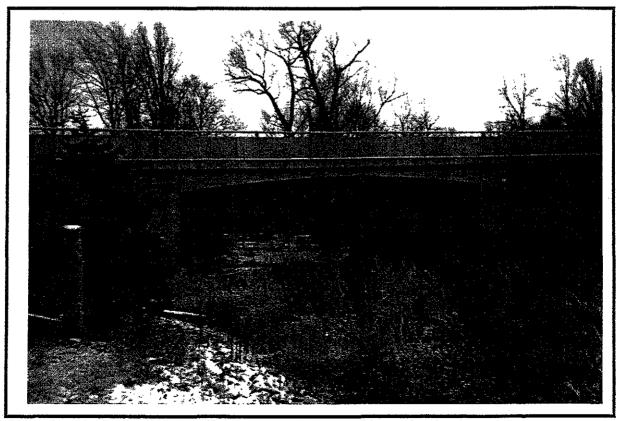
Upstream view of the East Sixteen Mile Creek bridge at Steeles Avenue.
